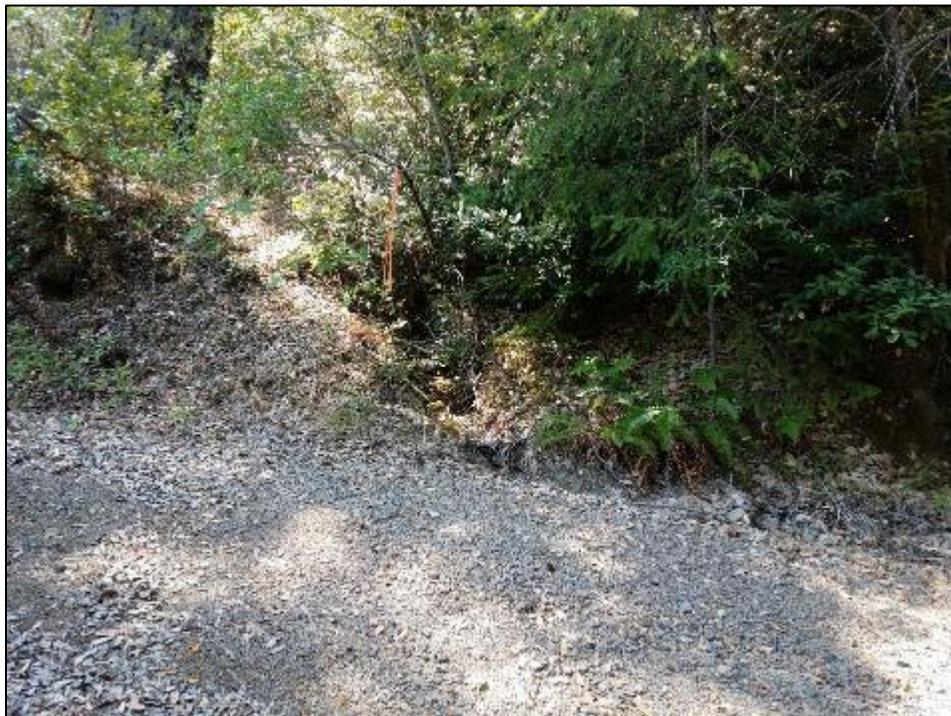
Site #40, looking upstream from the centerline of the road at the diverted stream channel.
